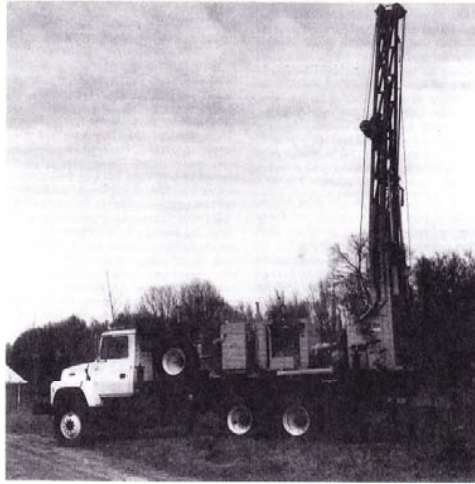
Truck-Mounted Rotary Drill Rig with a Hydraulic Drive System
